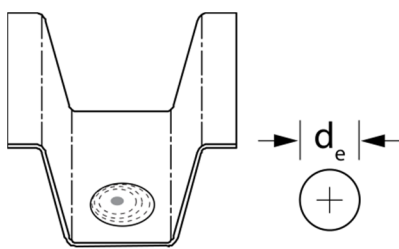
HEADED STUD ANCHOR AND REINFORCING DETAILS
